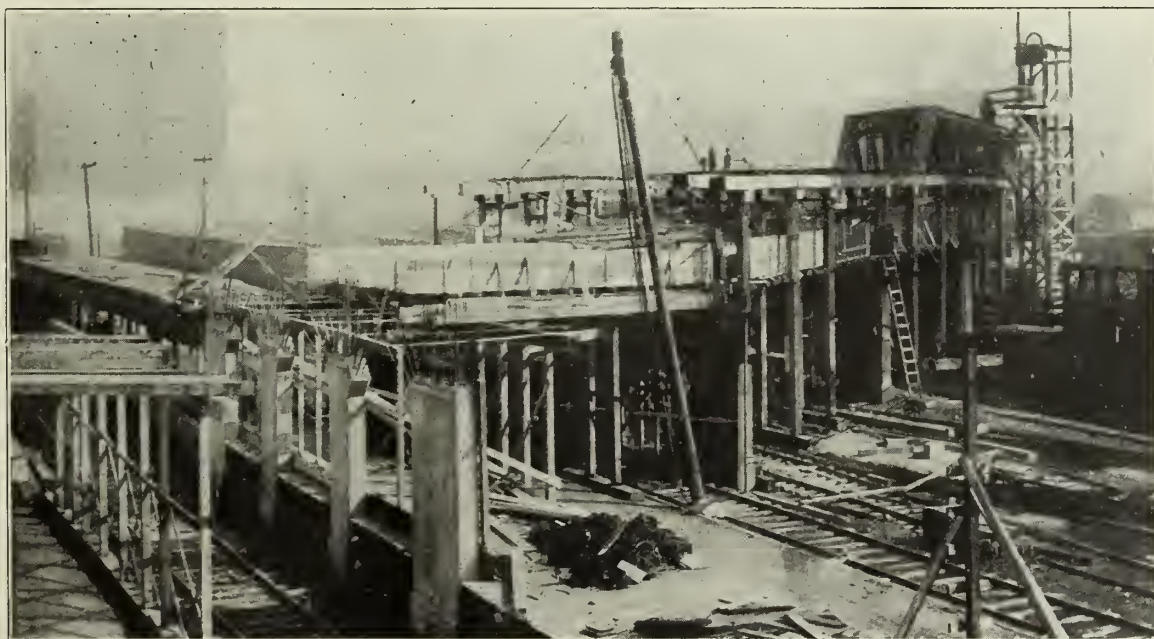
View of Milwaukee Ave. Viaduct, Looking Southeast from Desplaines St., Showing Concrete Bents Finished and Falsework and Forms Under Construction.
